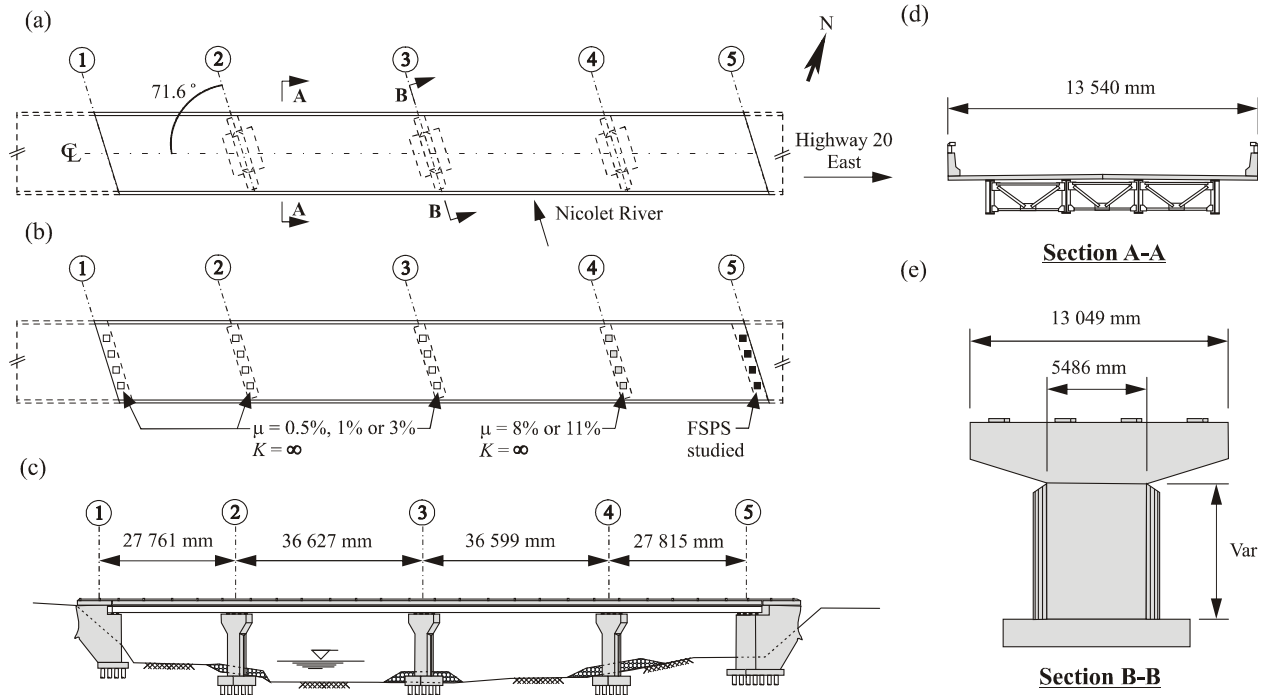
Bridge studied: (a) Plan view; (b) Bearing properties; (c) Elevation; (d) Deck; (e) Pier.
